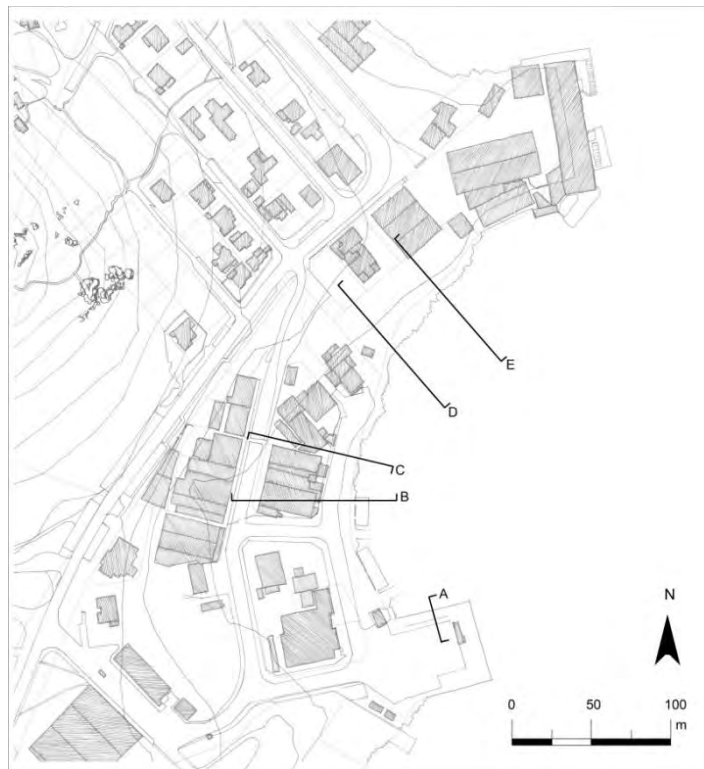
Location of the sections of existing site (Figure 57 to Figure 59)
